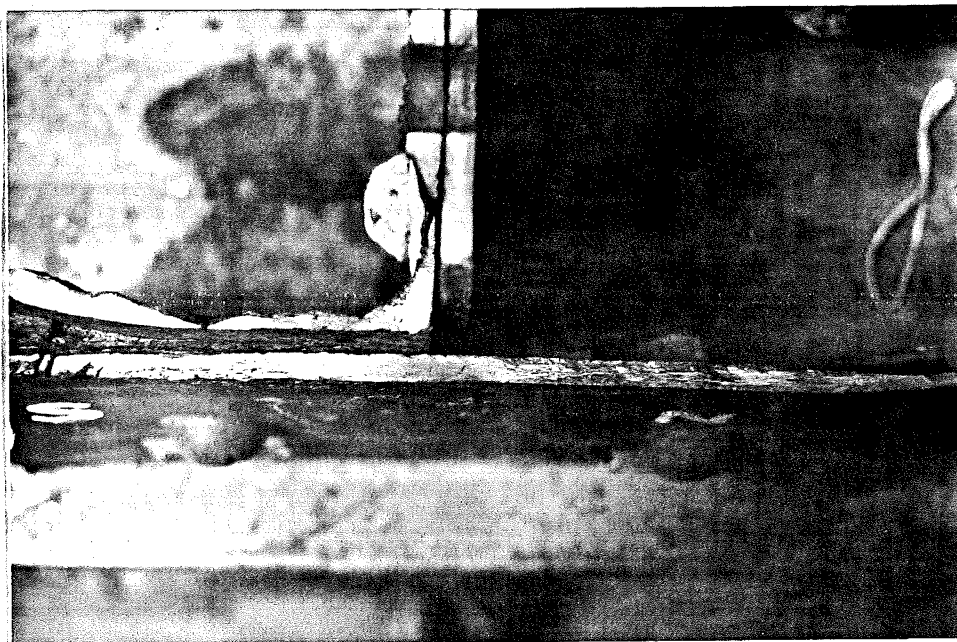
Cracked Section 1-1 of Girder No. 10
